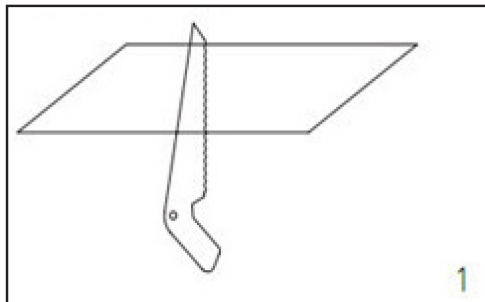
Ceiling Opening L: 225 x W: 127mm.
